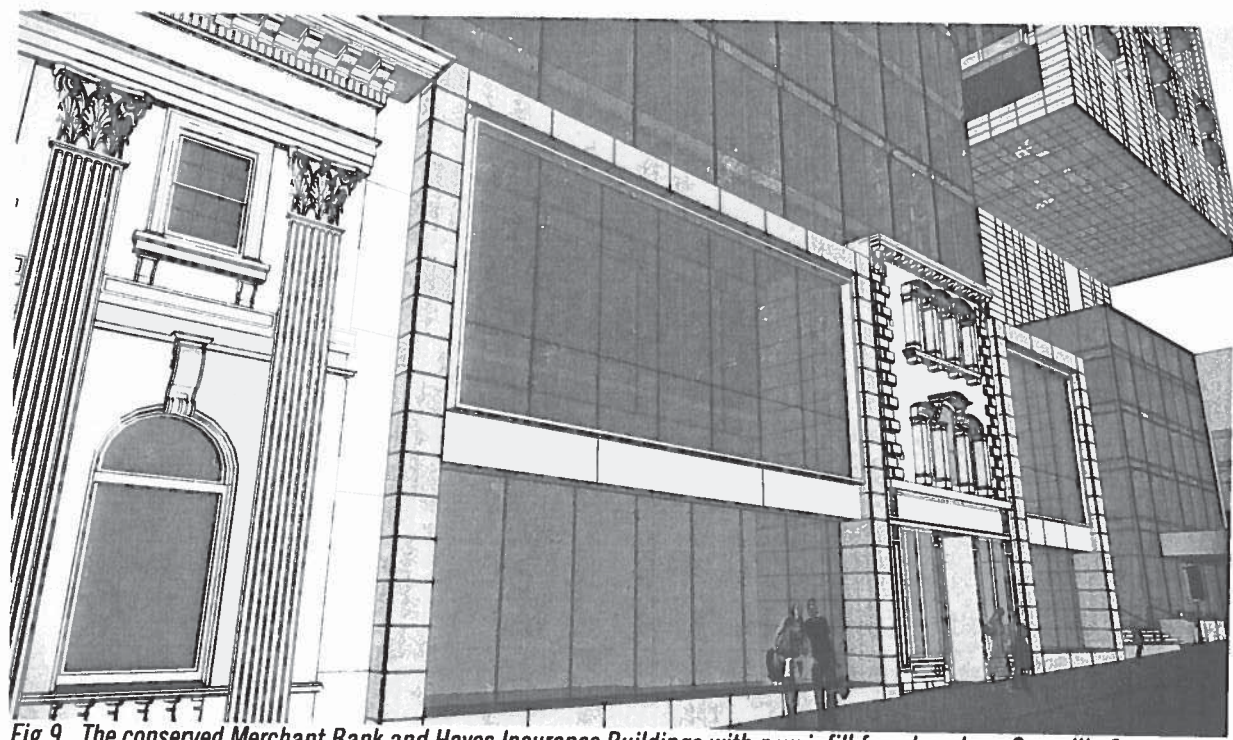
The conserved Merchant Bank and Hayes Insurance Buildings with new infill facades along Granville Street.
